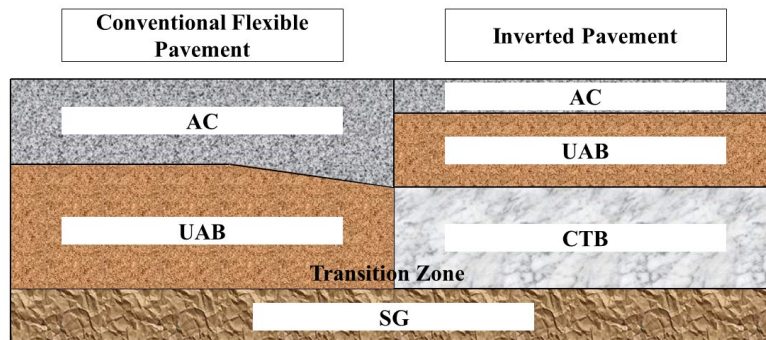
The conventional and inverted pavement test sections constructed at the entrance of the Vulcan Materials Quarry in Knoxville, TN
